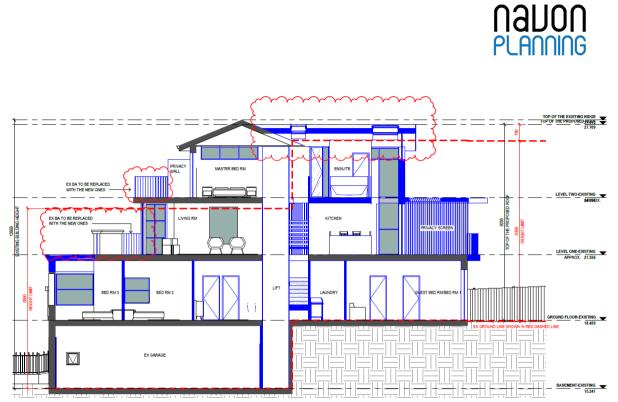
Eastern section showing the existing and proposed variation (Section A)
